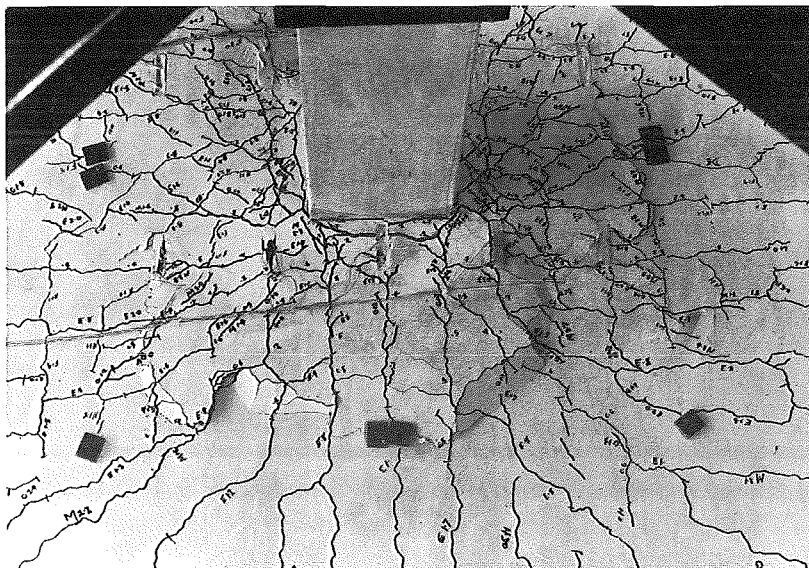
FAILURE SURFACE OF SPECIMEN 3C
